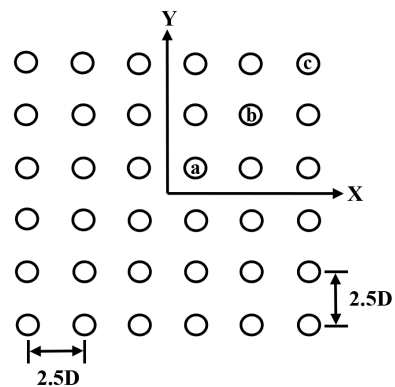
(c). Locations of piles inside a 6×6 pile group (a : G (66a); b : G (66b); c : G (66c))
